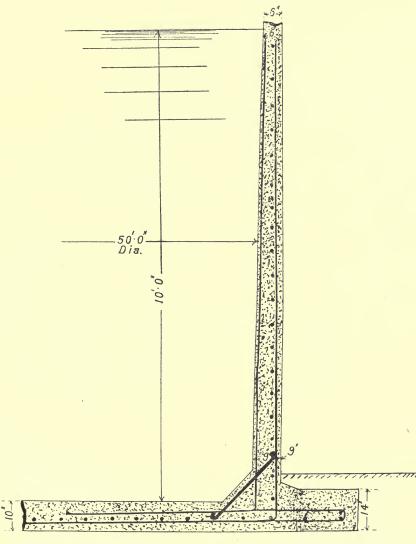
Reinforced Concrete Wall for Circular Reservoir.
